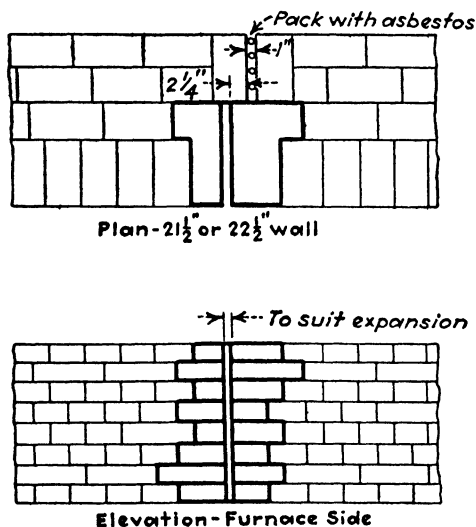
Expansion joints should be vertical in elevation and staggered in plan to reduce air leakage.
